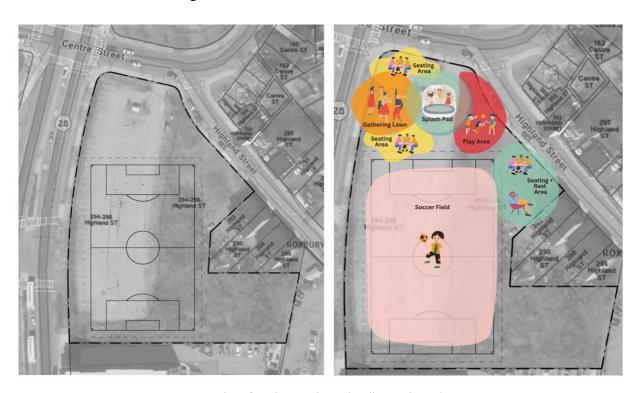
RCC site plan for the parking lot #3 and students' concept map.
